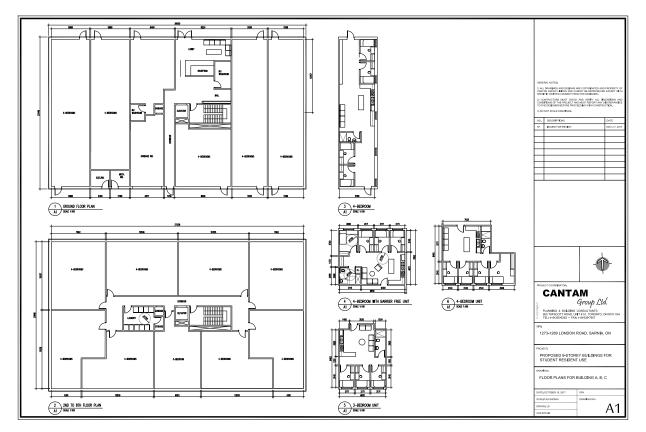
Proposed Typical Floor Plan (Credit to Cantam Group Ltd.)
